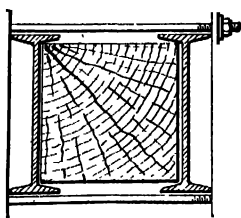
A — Method of reinforcing wood shore for heavy loads.
